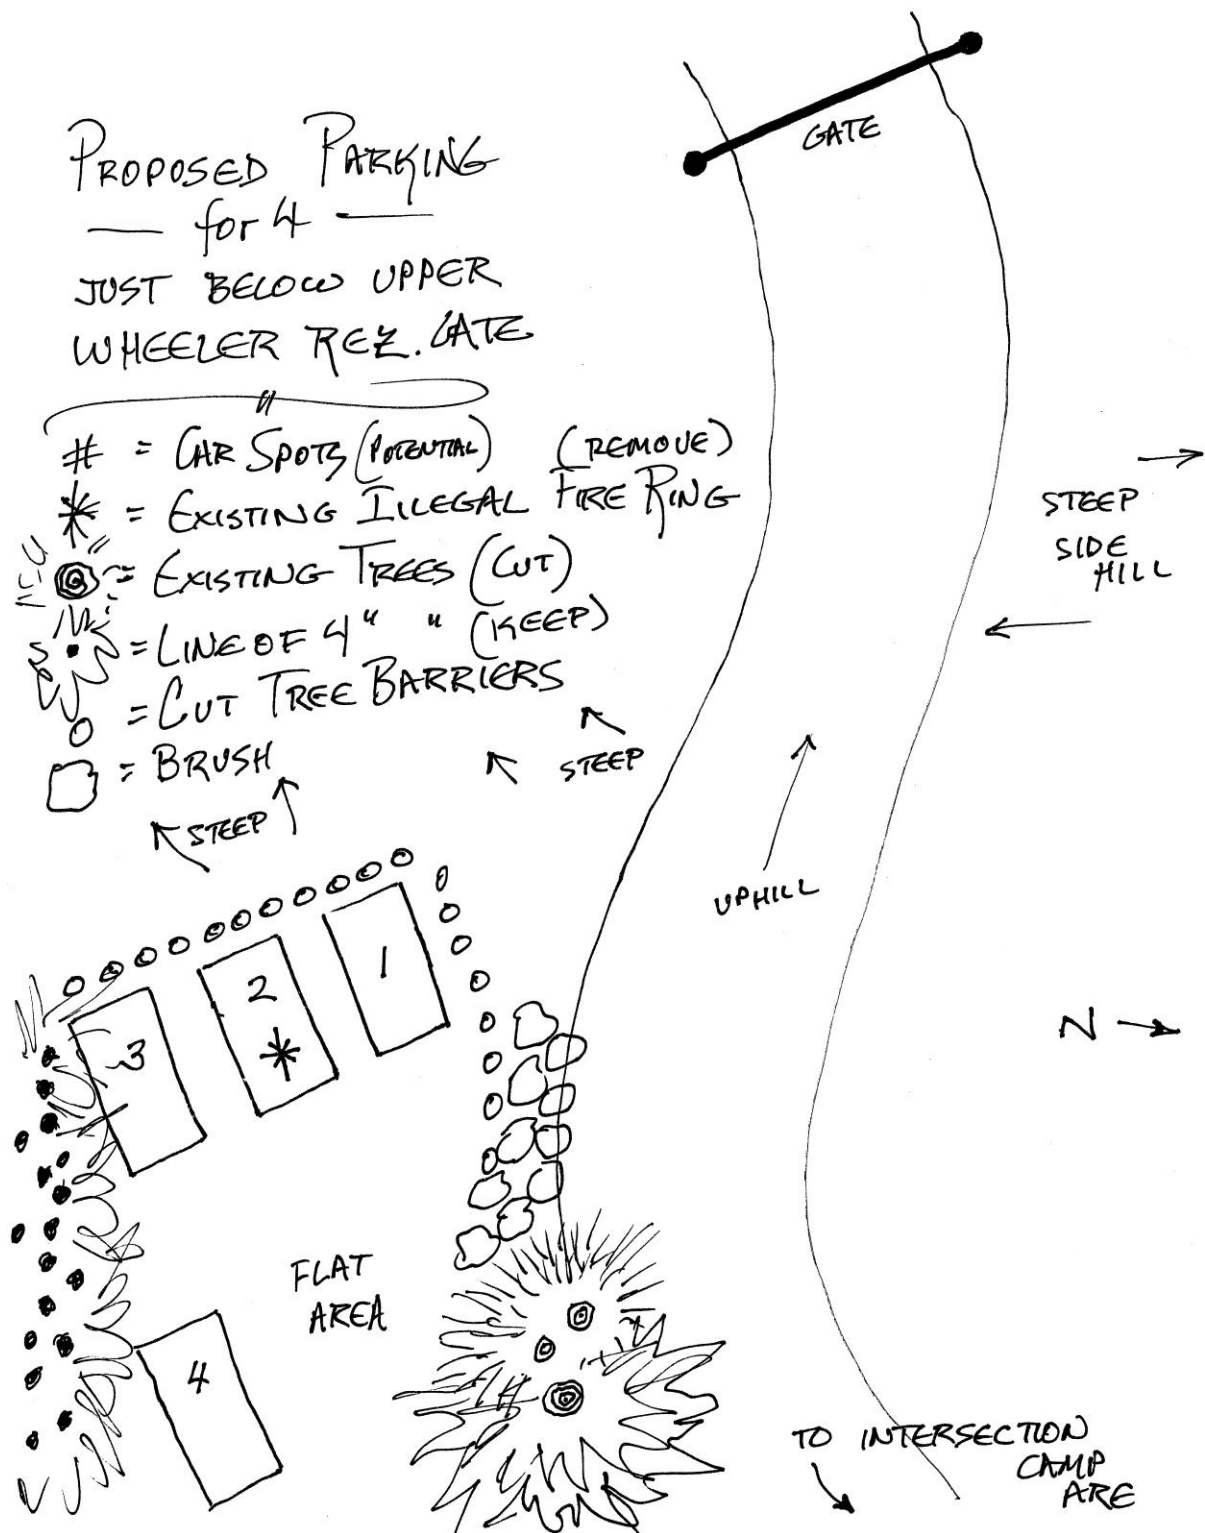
Upper Wheeler Reservoir Access Draft Design Drawing
